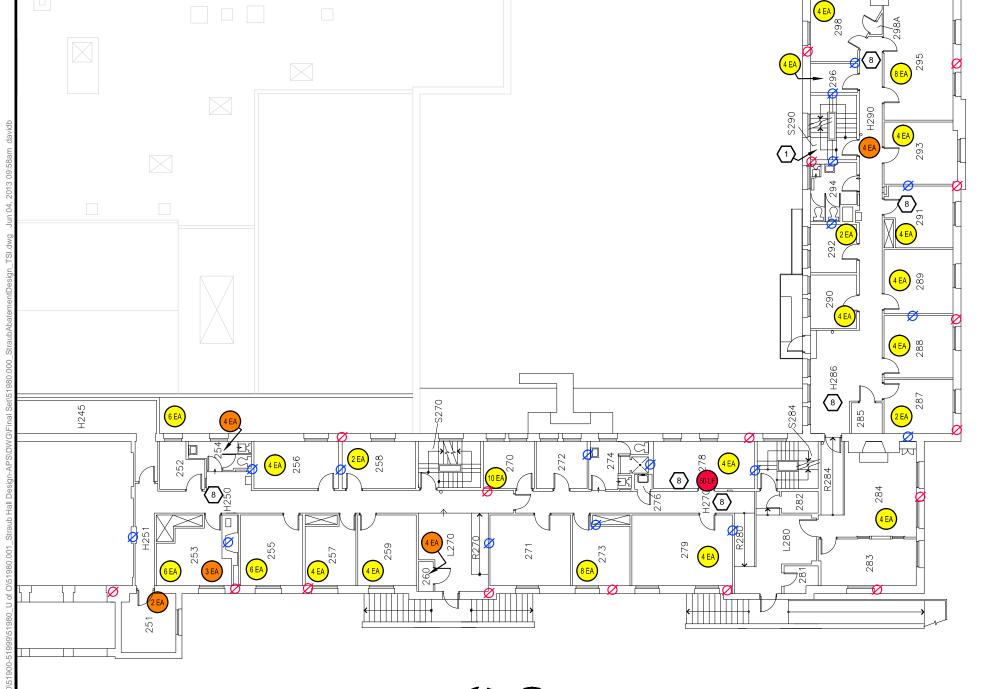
STRAUB HALL - SECOND FLOOR - SOUTH HALF
